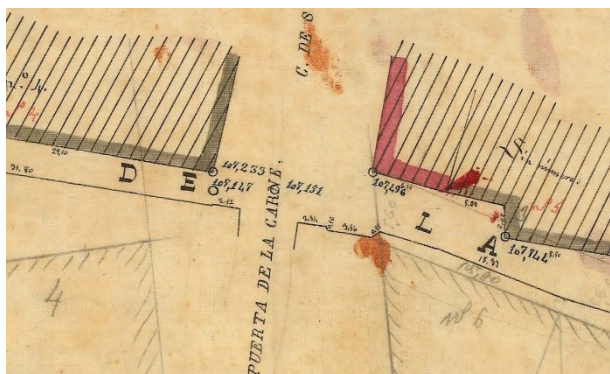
Detail of the façade alignments plan showing the location of the *Puerta de la Carne*, c. 1900. Ayuntamiento de Sevilla, Gerencia de Urbanismo, 10/2021.
